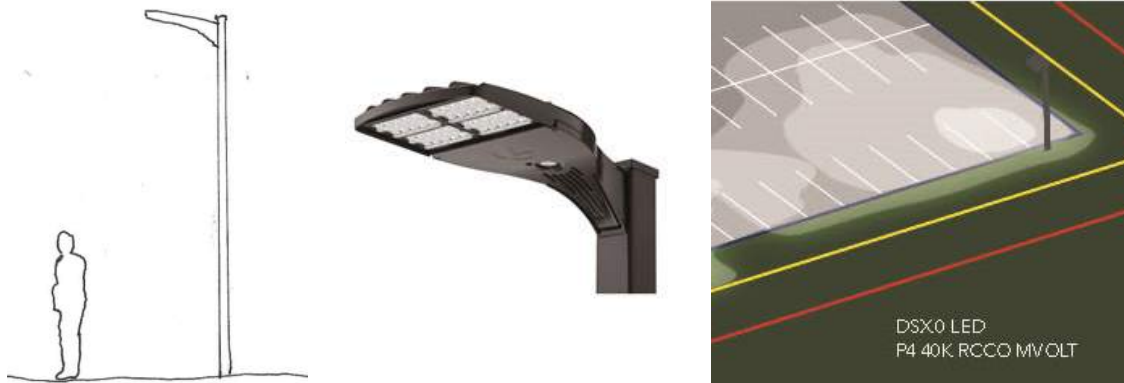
Site Lighting Standards for Outdoor Poles
